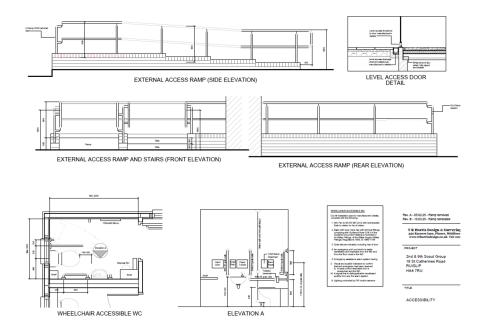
Proposed Elevations (please note – larger version of plan can be found in the Committee Plan Pack)
